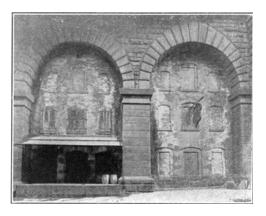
Old East River Bridge Warehouses in Manhattan Approach.
